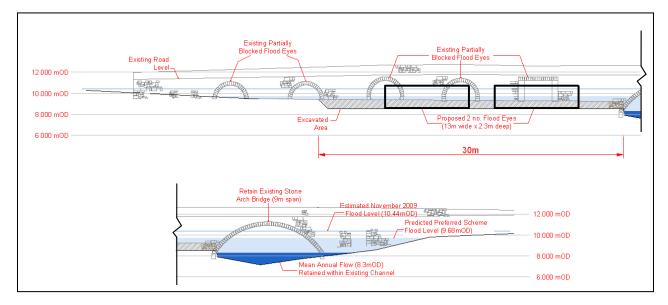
Proposed Works Channel Works from Killeely Beg Bridge to Dunkellin Bridge
